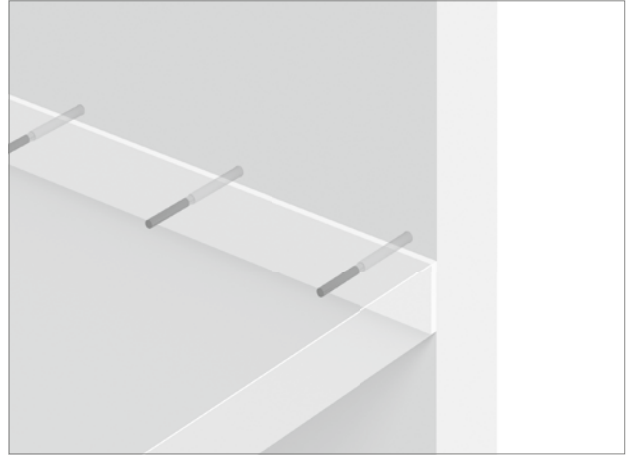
Schöck Stacon® type LD: slab-wall connection
